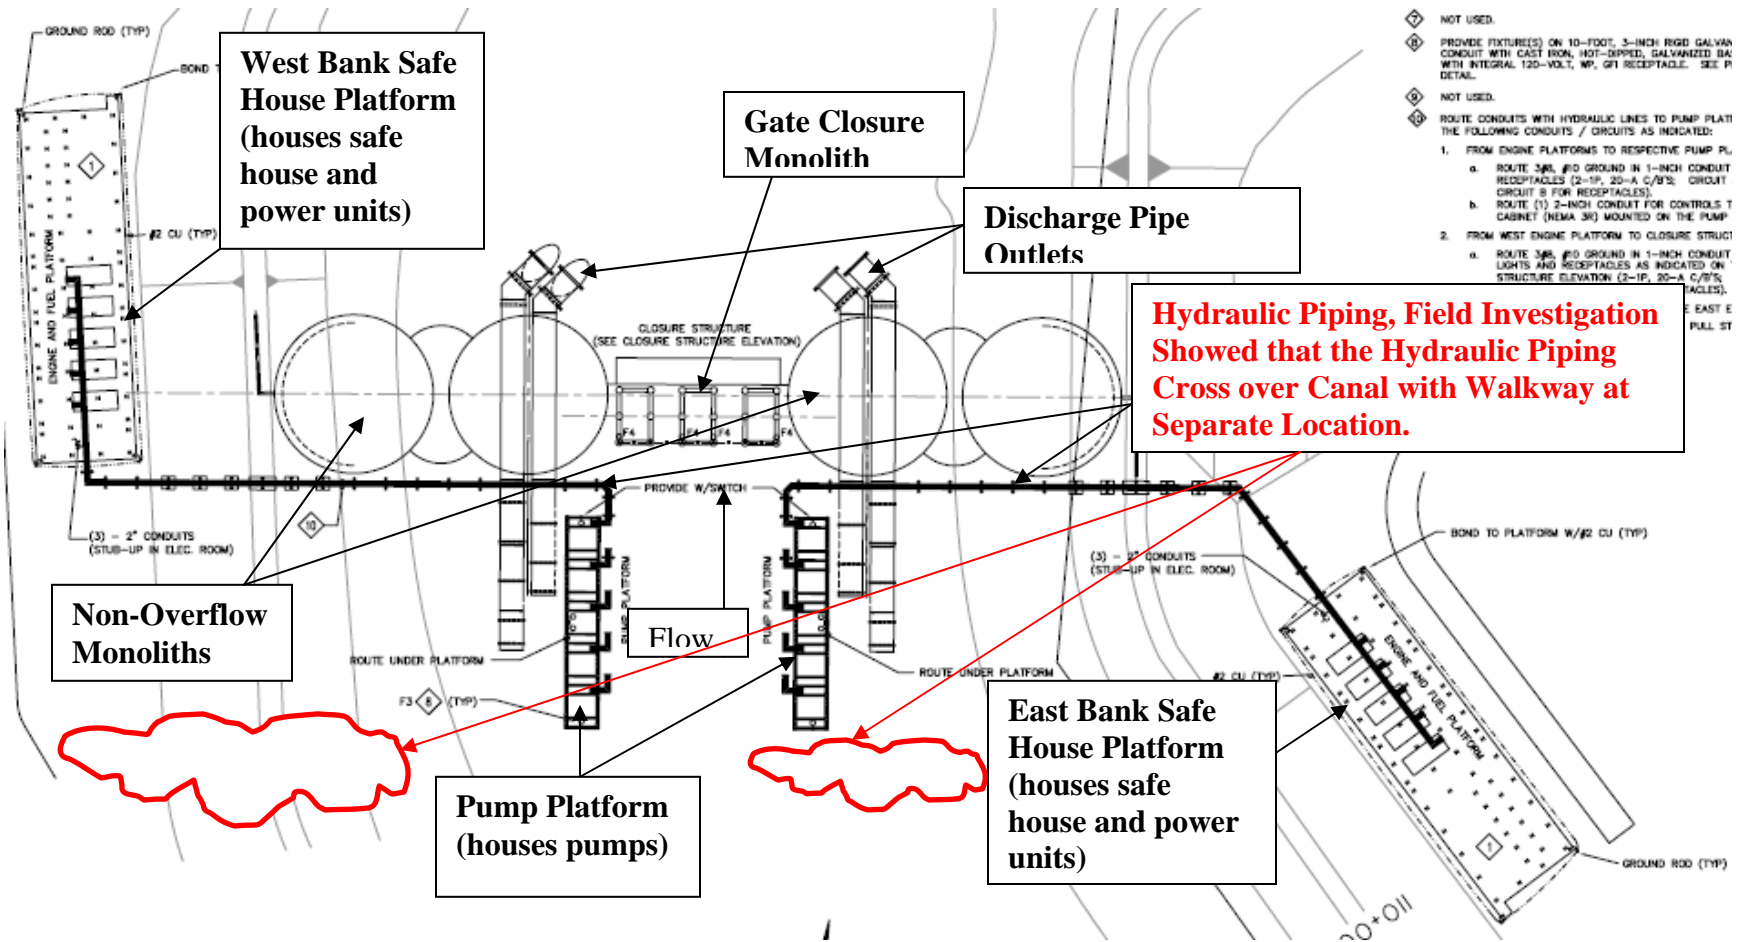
Orleans Avenue ICS Facility Phase 1 Site Plan
